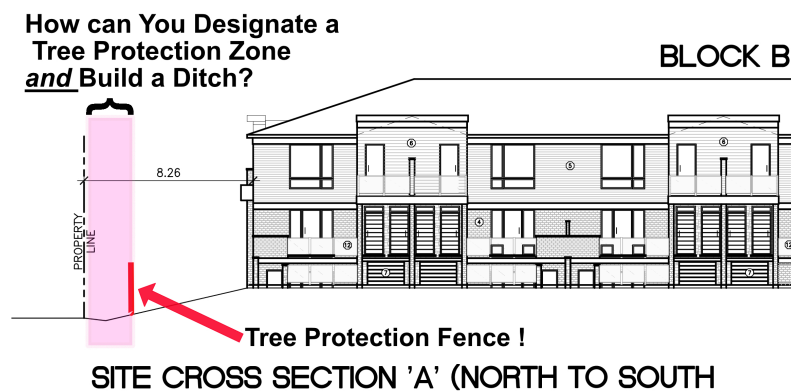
Zelinka Priamo building elevation plan shown with “Tree Protection Zone” indicated as a red barrier. Note that a drainage ditch is constructed at the border and within the zone. Which plan do we believe?
